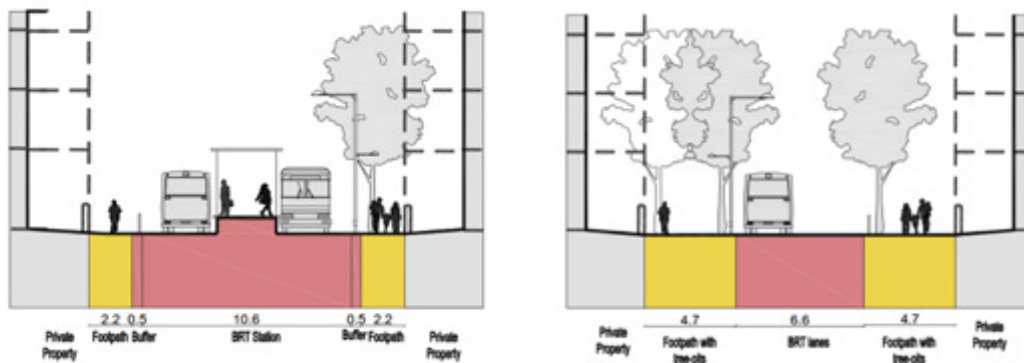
16 m BRT cross section with two-way BRT lanes and footpaths on both sides.
